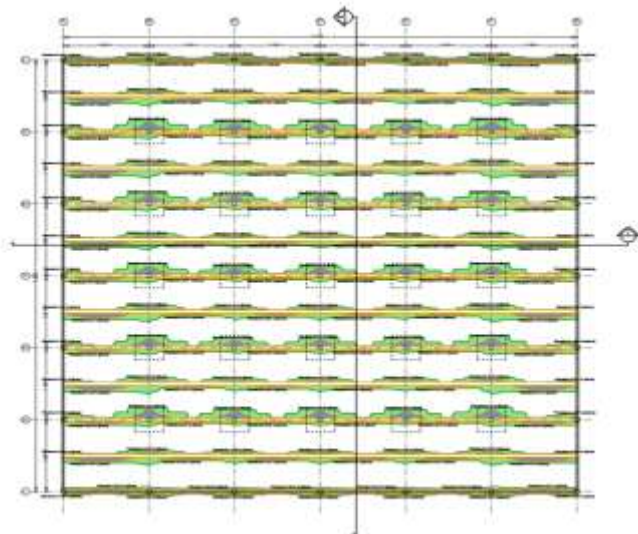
Reinforcement profile A for Flat Slab 6x6m.
